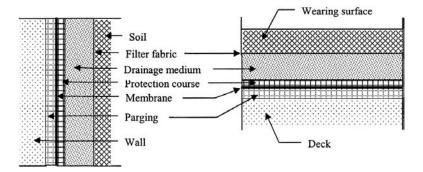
Vertical and horizontal membrane waterproofing systems.
